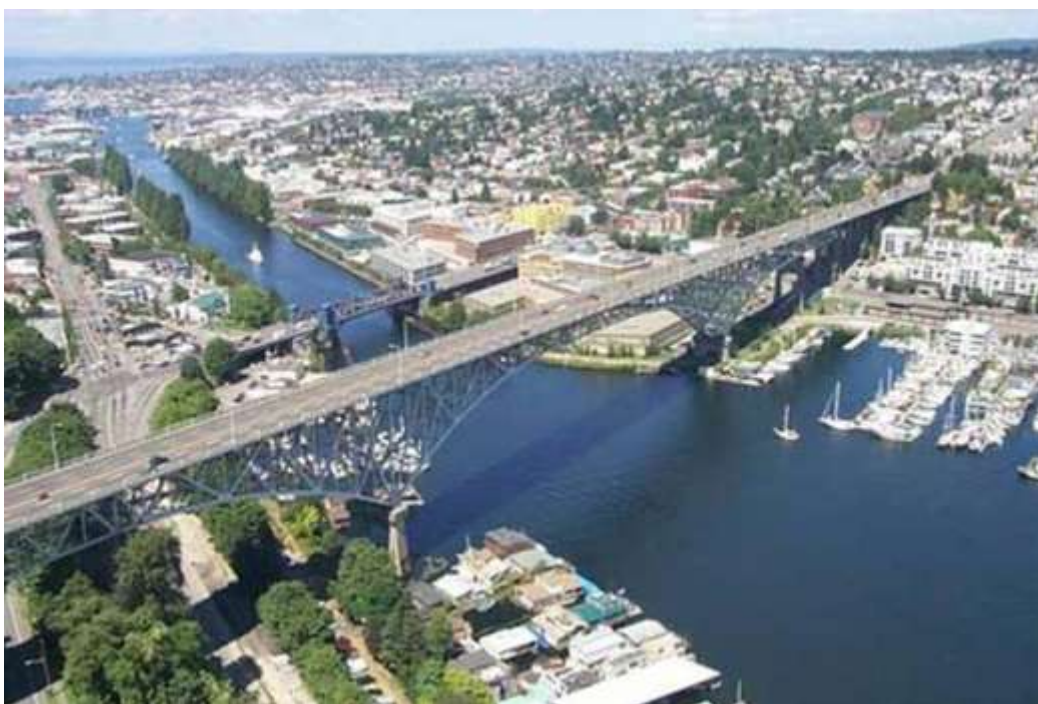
Overall Layout of the Aurora Avenue Bridge
